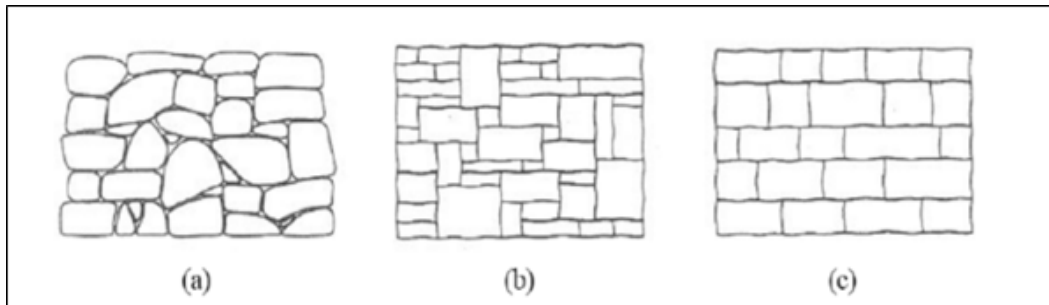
Masonry stone walls a) Rubble stone, b) Cut stone, c) Lined Cut Stone (Lourenço, 1998).
